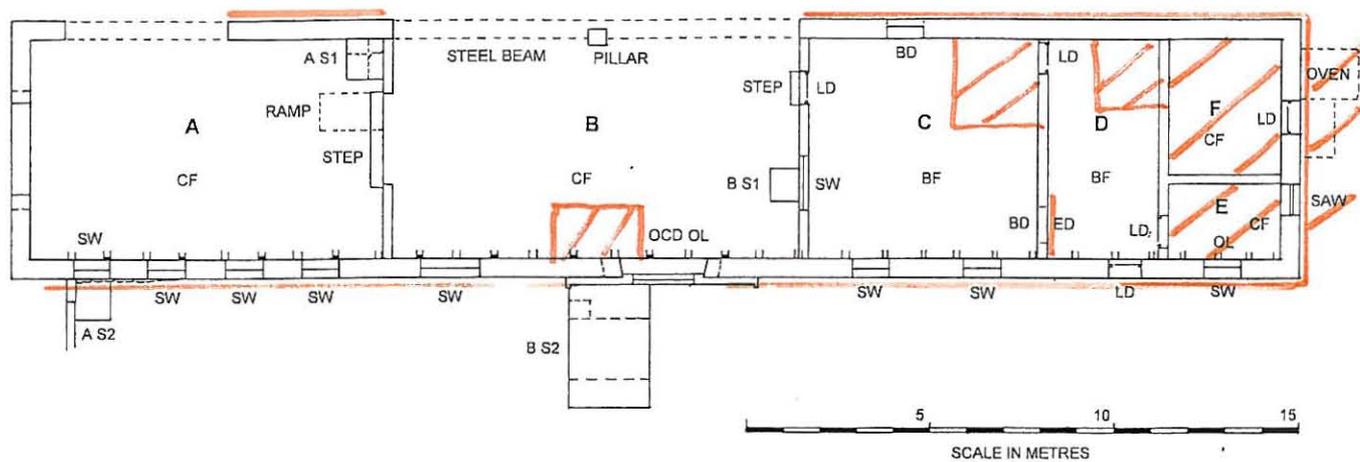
Site plan of the Barn with indications of plaster stripping and excavations to establish more definitive answers on the building's development.
